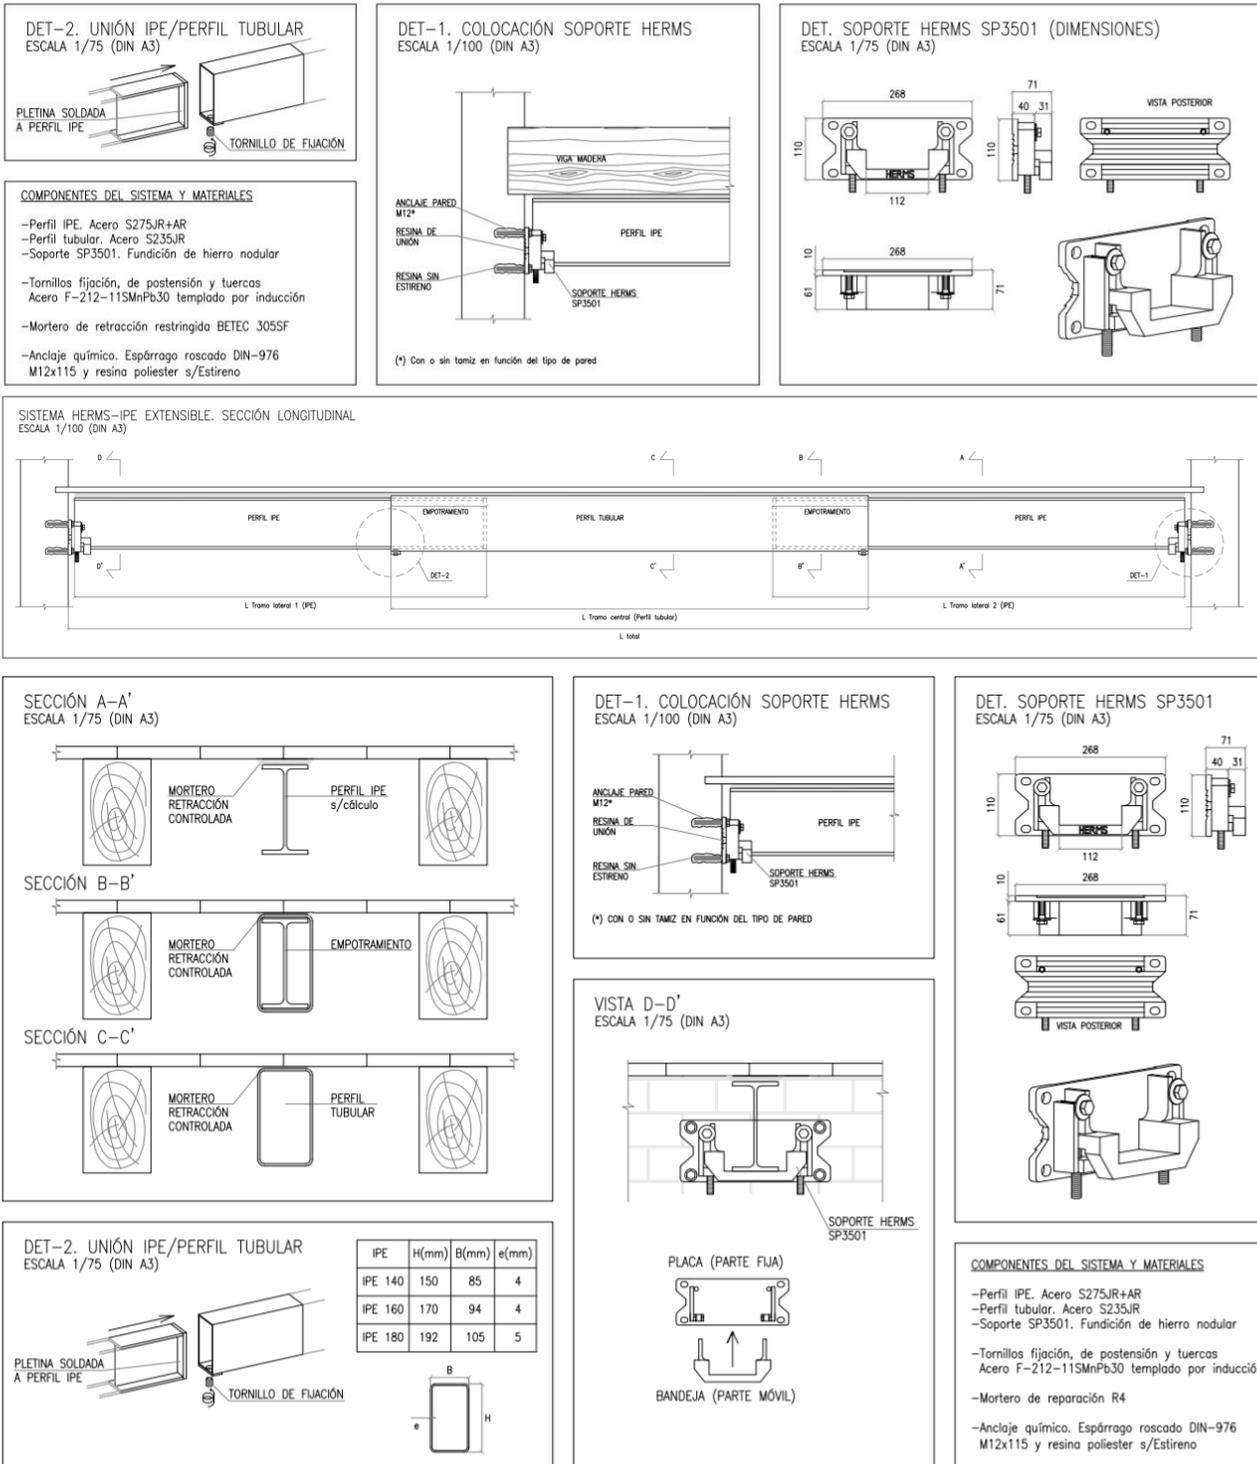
Drawings and details of the Herms IPE Extensible system. ©HERMS
